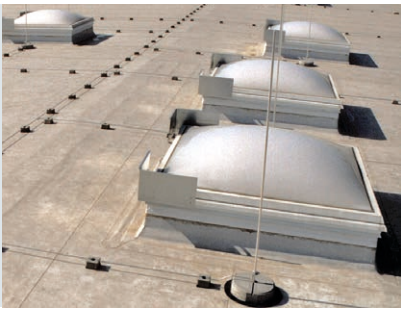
Domelight located on a non-metal roof of a structure without external lightning protection system
